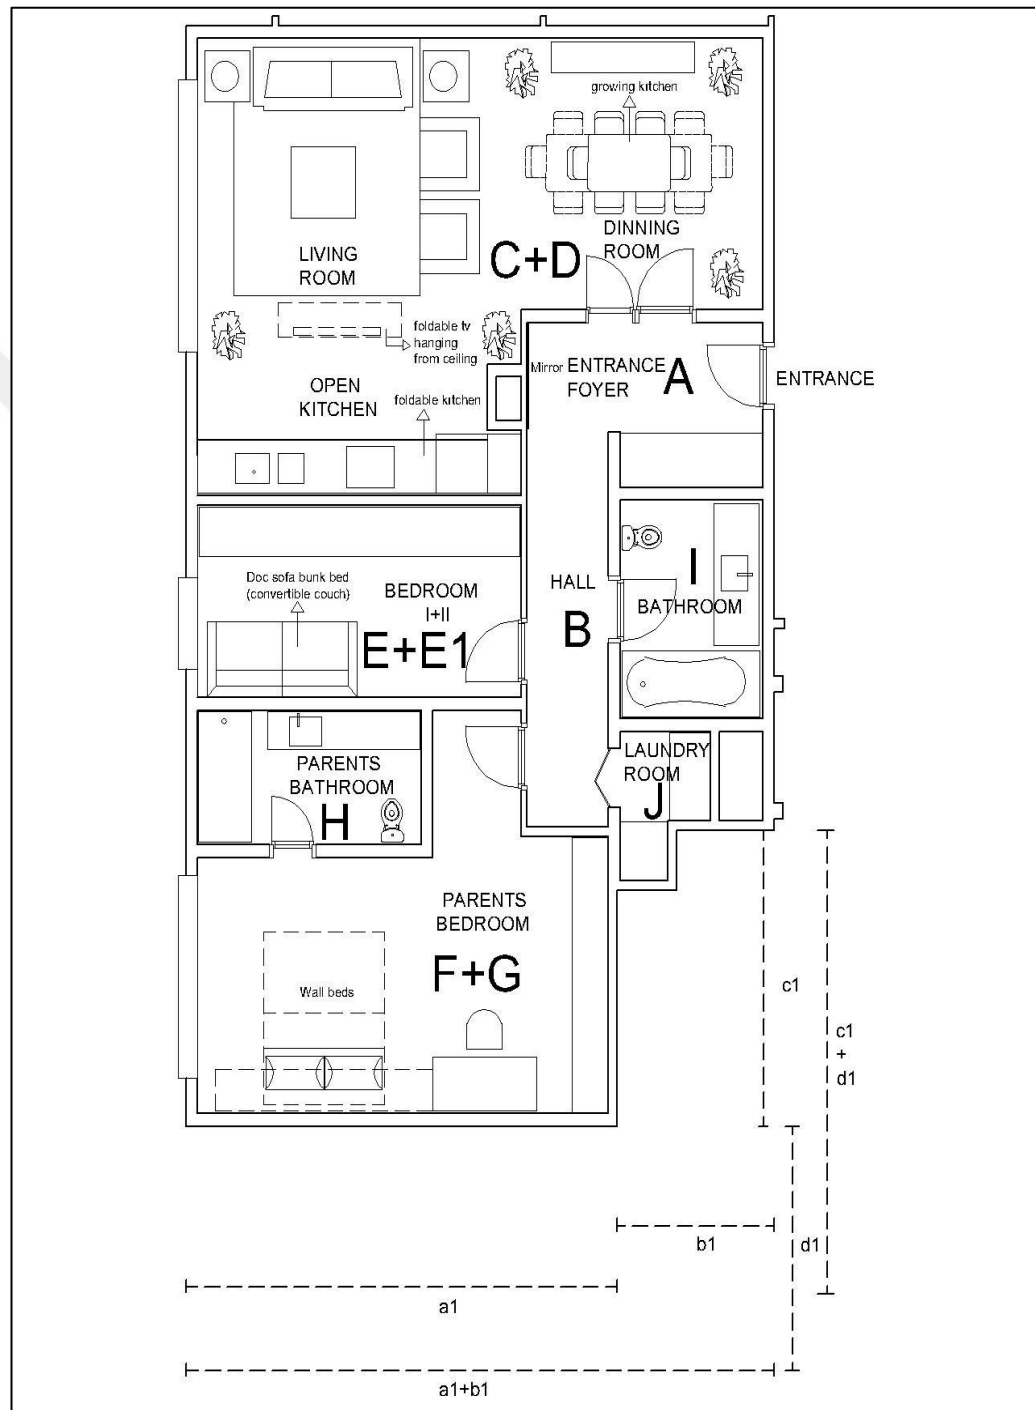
Secondary transformation plan of the apartment floor plan, designed by author.
